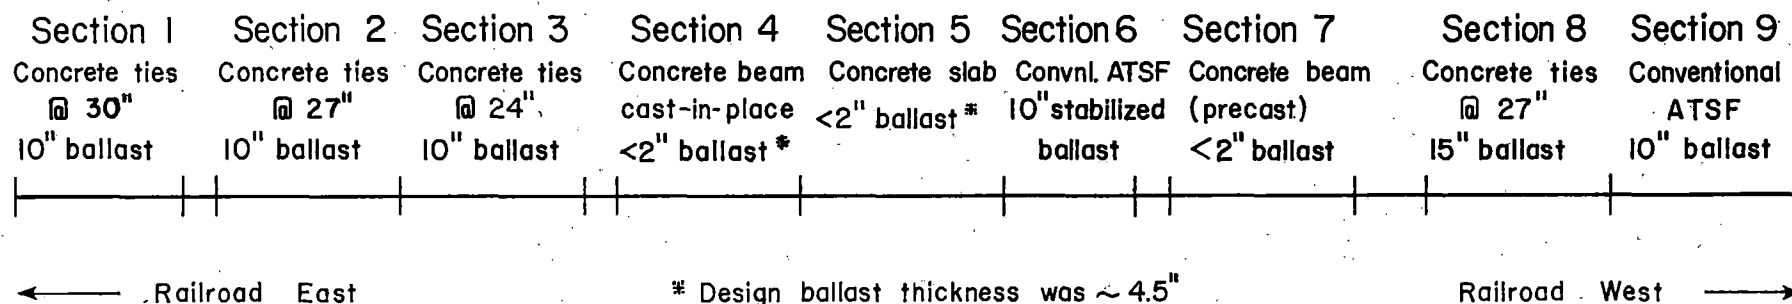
SCHEMATIC PLAN OF TEST TRACK
